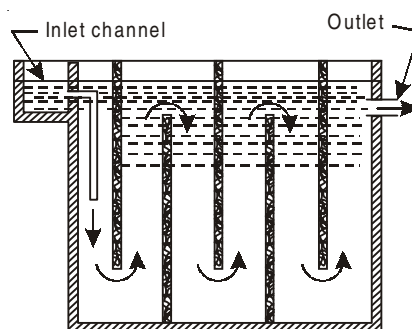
Sectional elevation of a baffle mixing basin.
